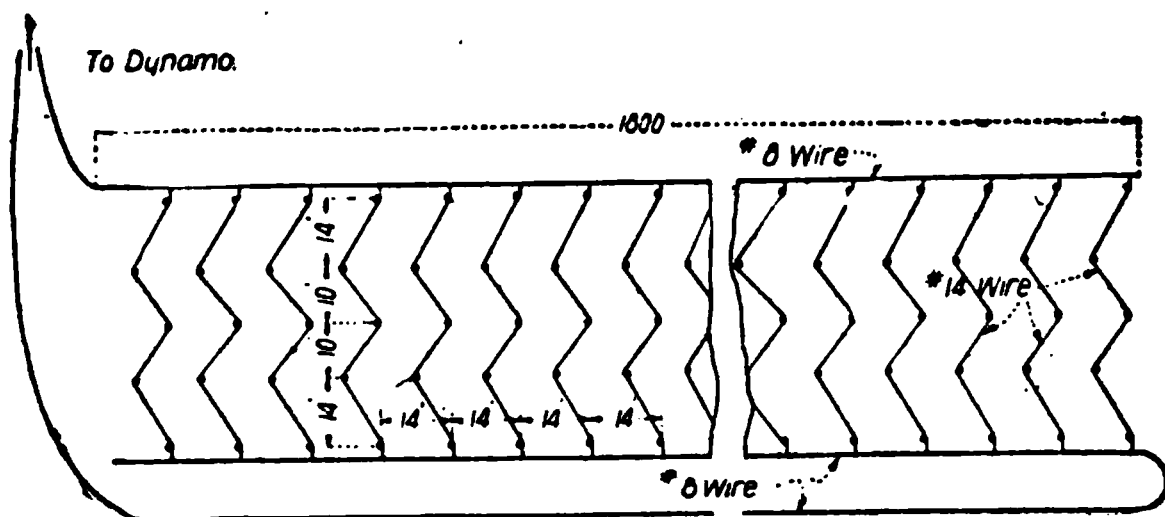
Sketch Showing Layout of Holes and Wiring for Blasting a Railroad Cut.
